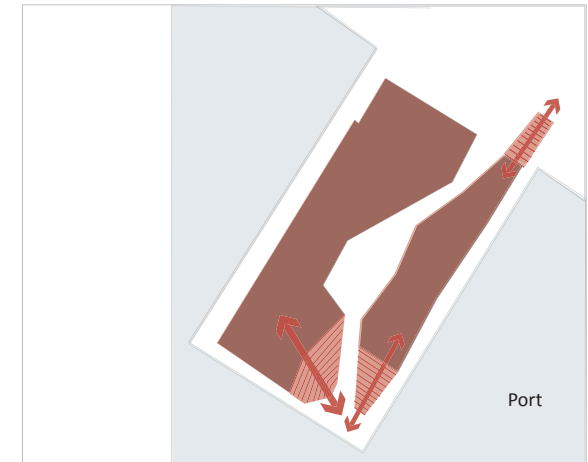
Points at which you can access the roof terrace. Limited to 3 access points and they all gradually decline to meet the ground plane. The steps are used as outdoor seating areas for an amphitheatre
